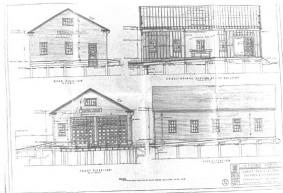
plans and elevations for the Great Egg Coast Guard station boat house that was built in 1938-39
